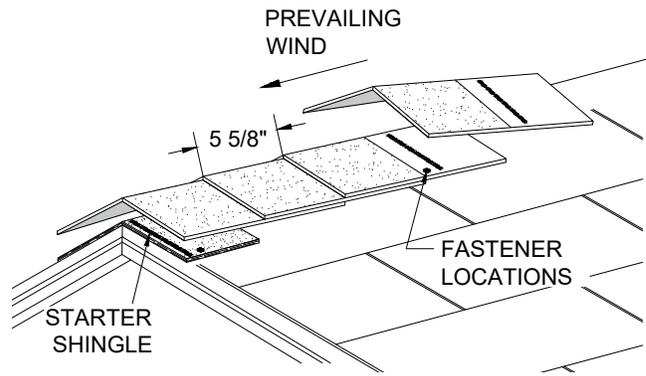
Placement and Fastening of RidgeFlex® Shingles, Maintaining the 5 5/8" Exposure
